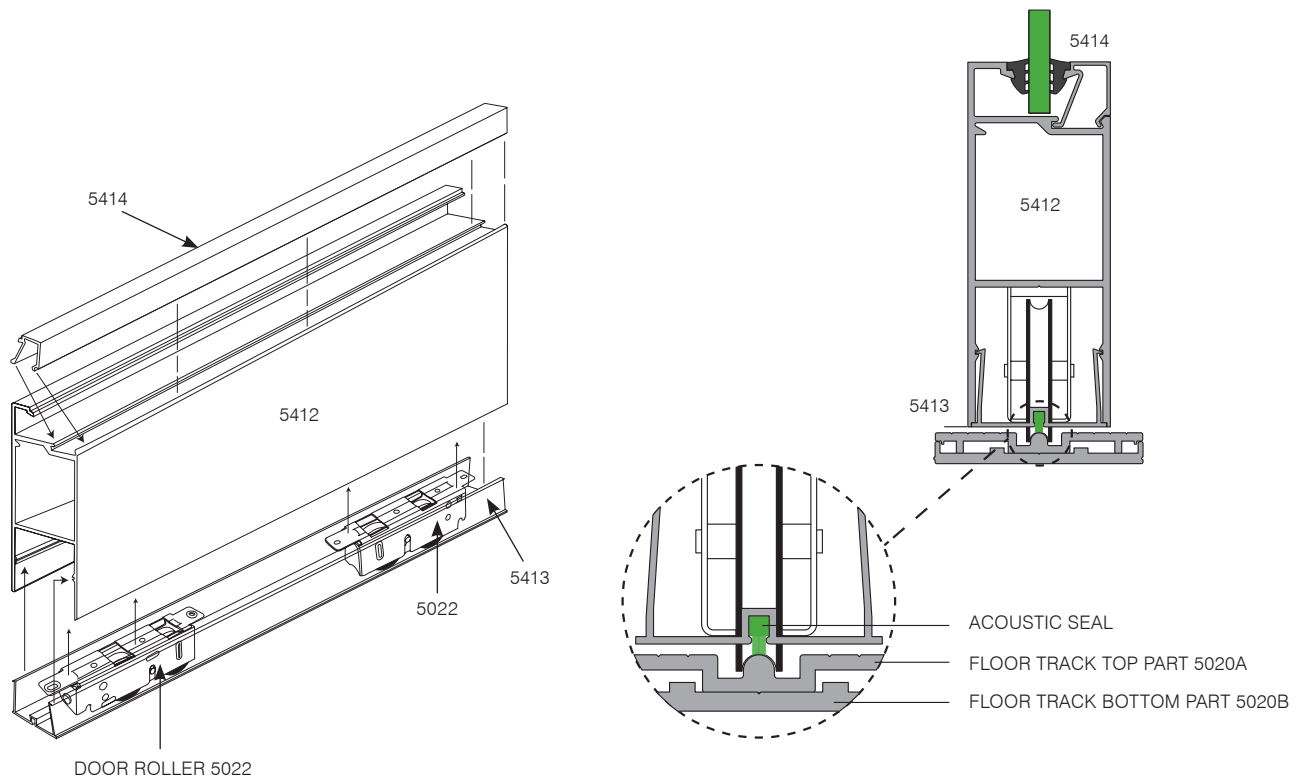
| Horizontal Detail for Multipanel Doors to Open Up Rooms
